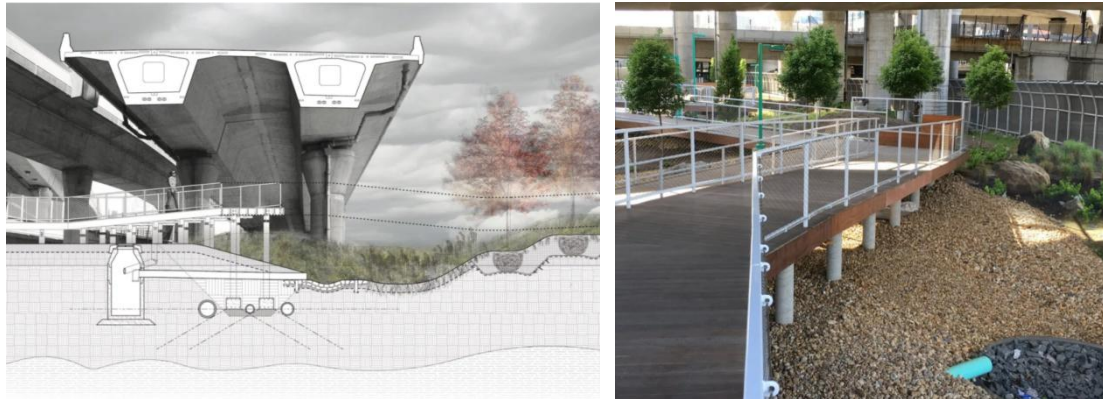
Ecological and pedestrian vertical stratification of the basic space plan under the Southeasterly Freeway in Boston(Image source: Archdaily)
